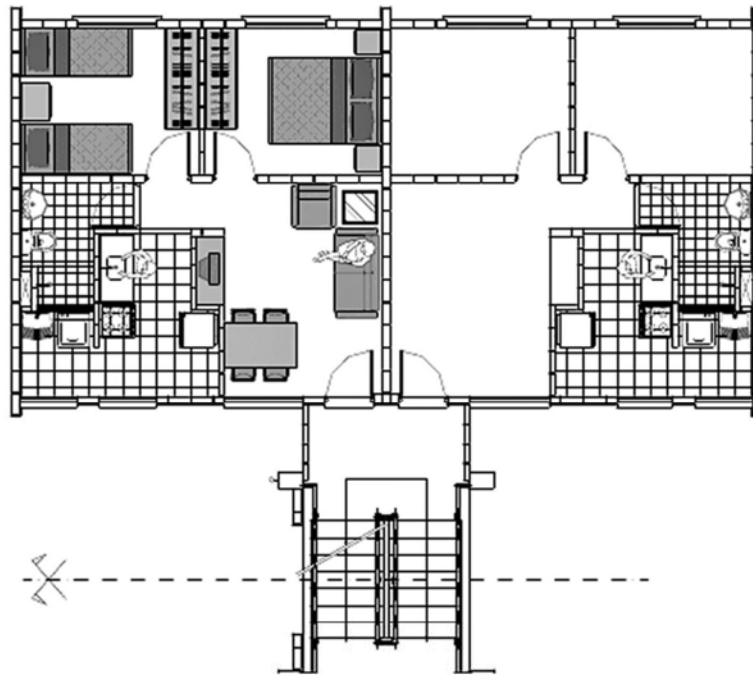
Example of two housing unit floor plans in a walk-up apartment block.
